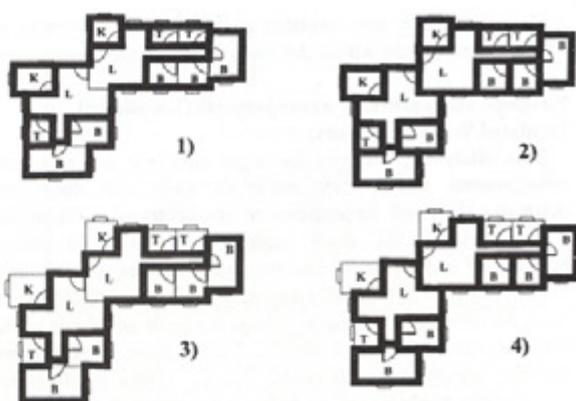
Envelope and partitions arrangements: 1) E arrangement, 2) A arrangement, 3) T arrangement, and 4) U arrangement where B stands for bedroom, L for living and dining room, K for kitchen, and T for toilet.
